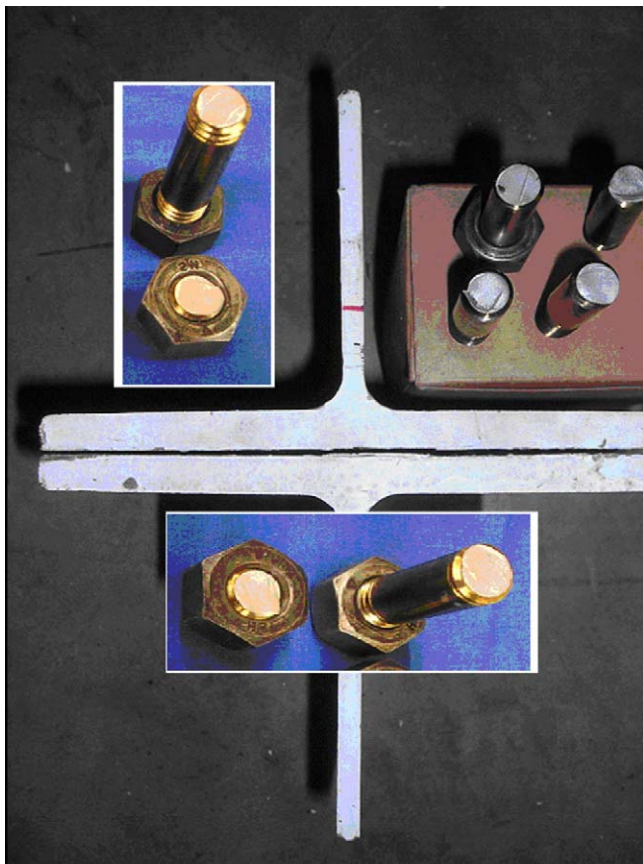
A tested WT-4 × 12-1 1/4-4 with SMA fasteners showing some typical failed bolts.
